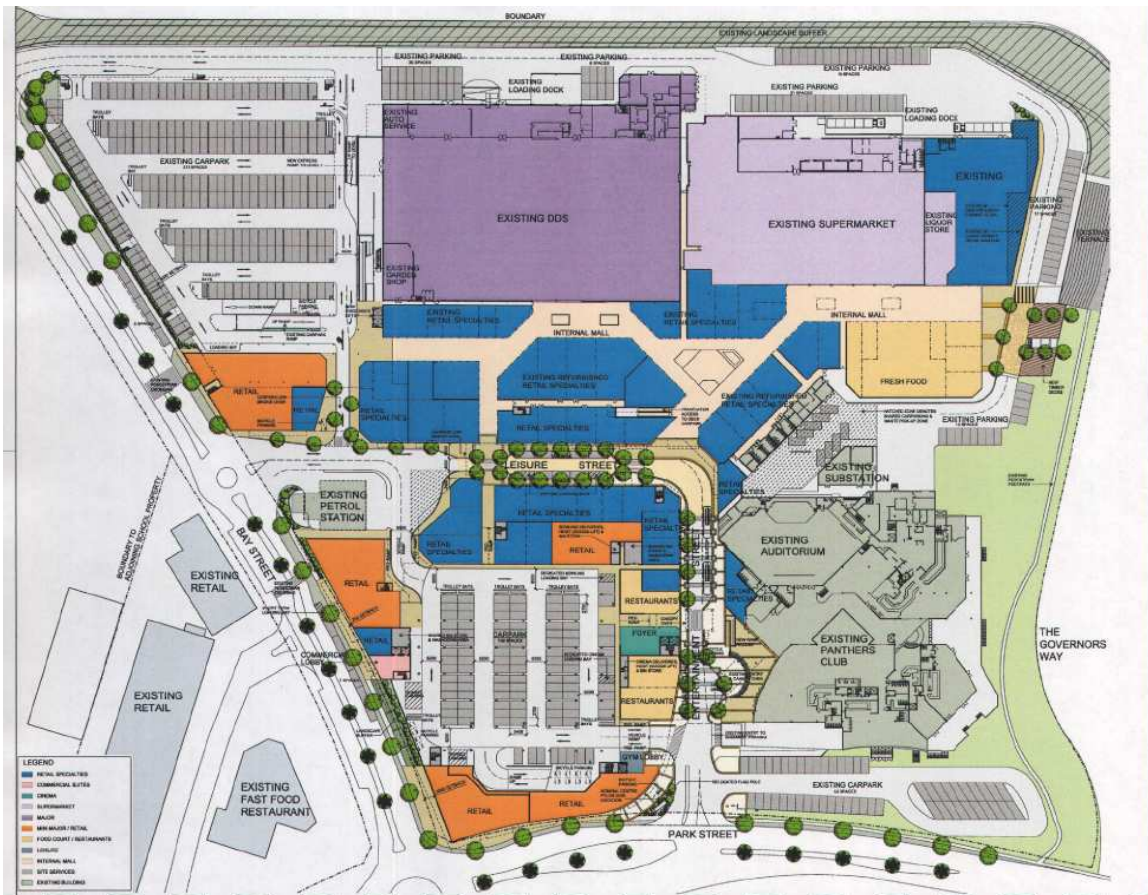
Ground floor level plan (Source: Preferred Project Report)
